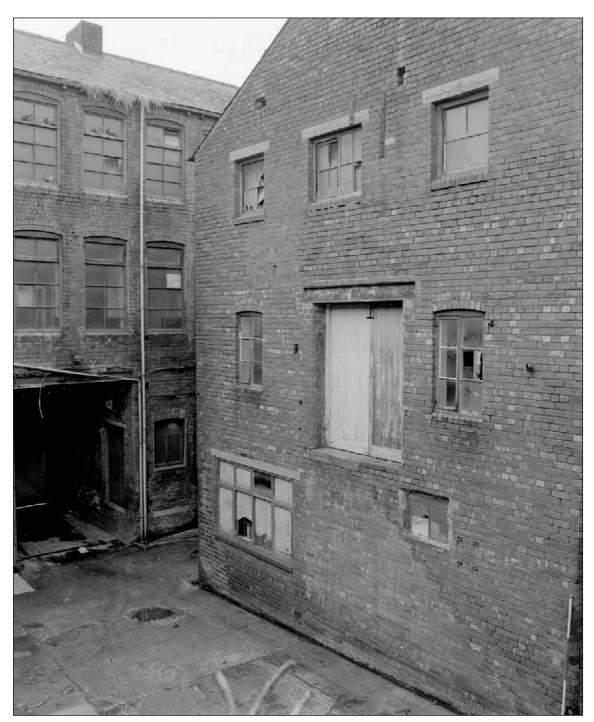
General view of south elevation of north range, west range beyond (film 11.10)
